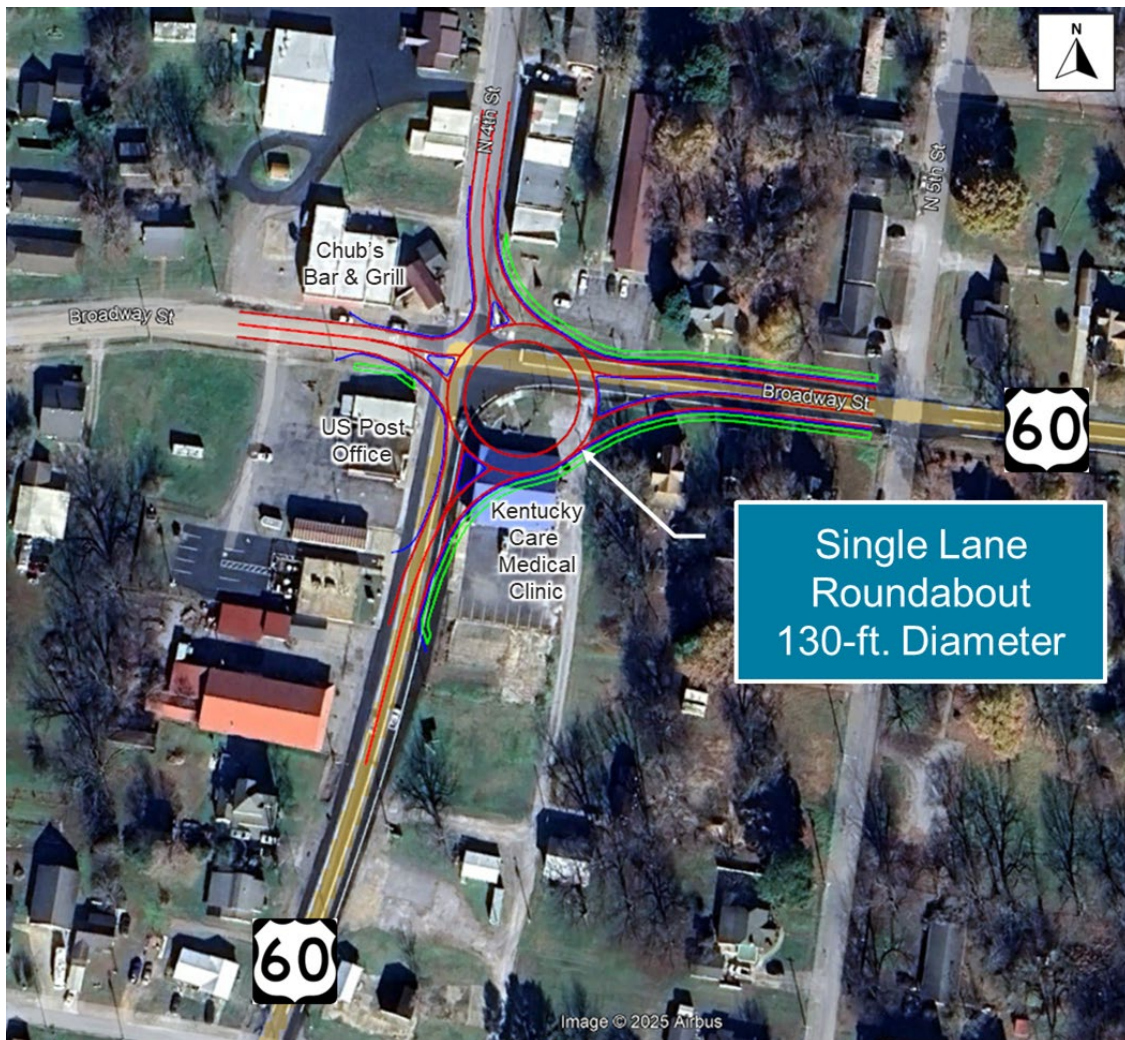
US 60 at Broadway Street in Barlow - Single Lane Roundabout
